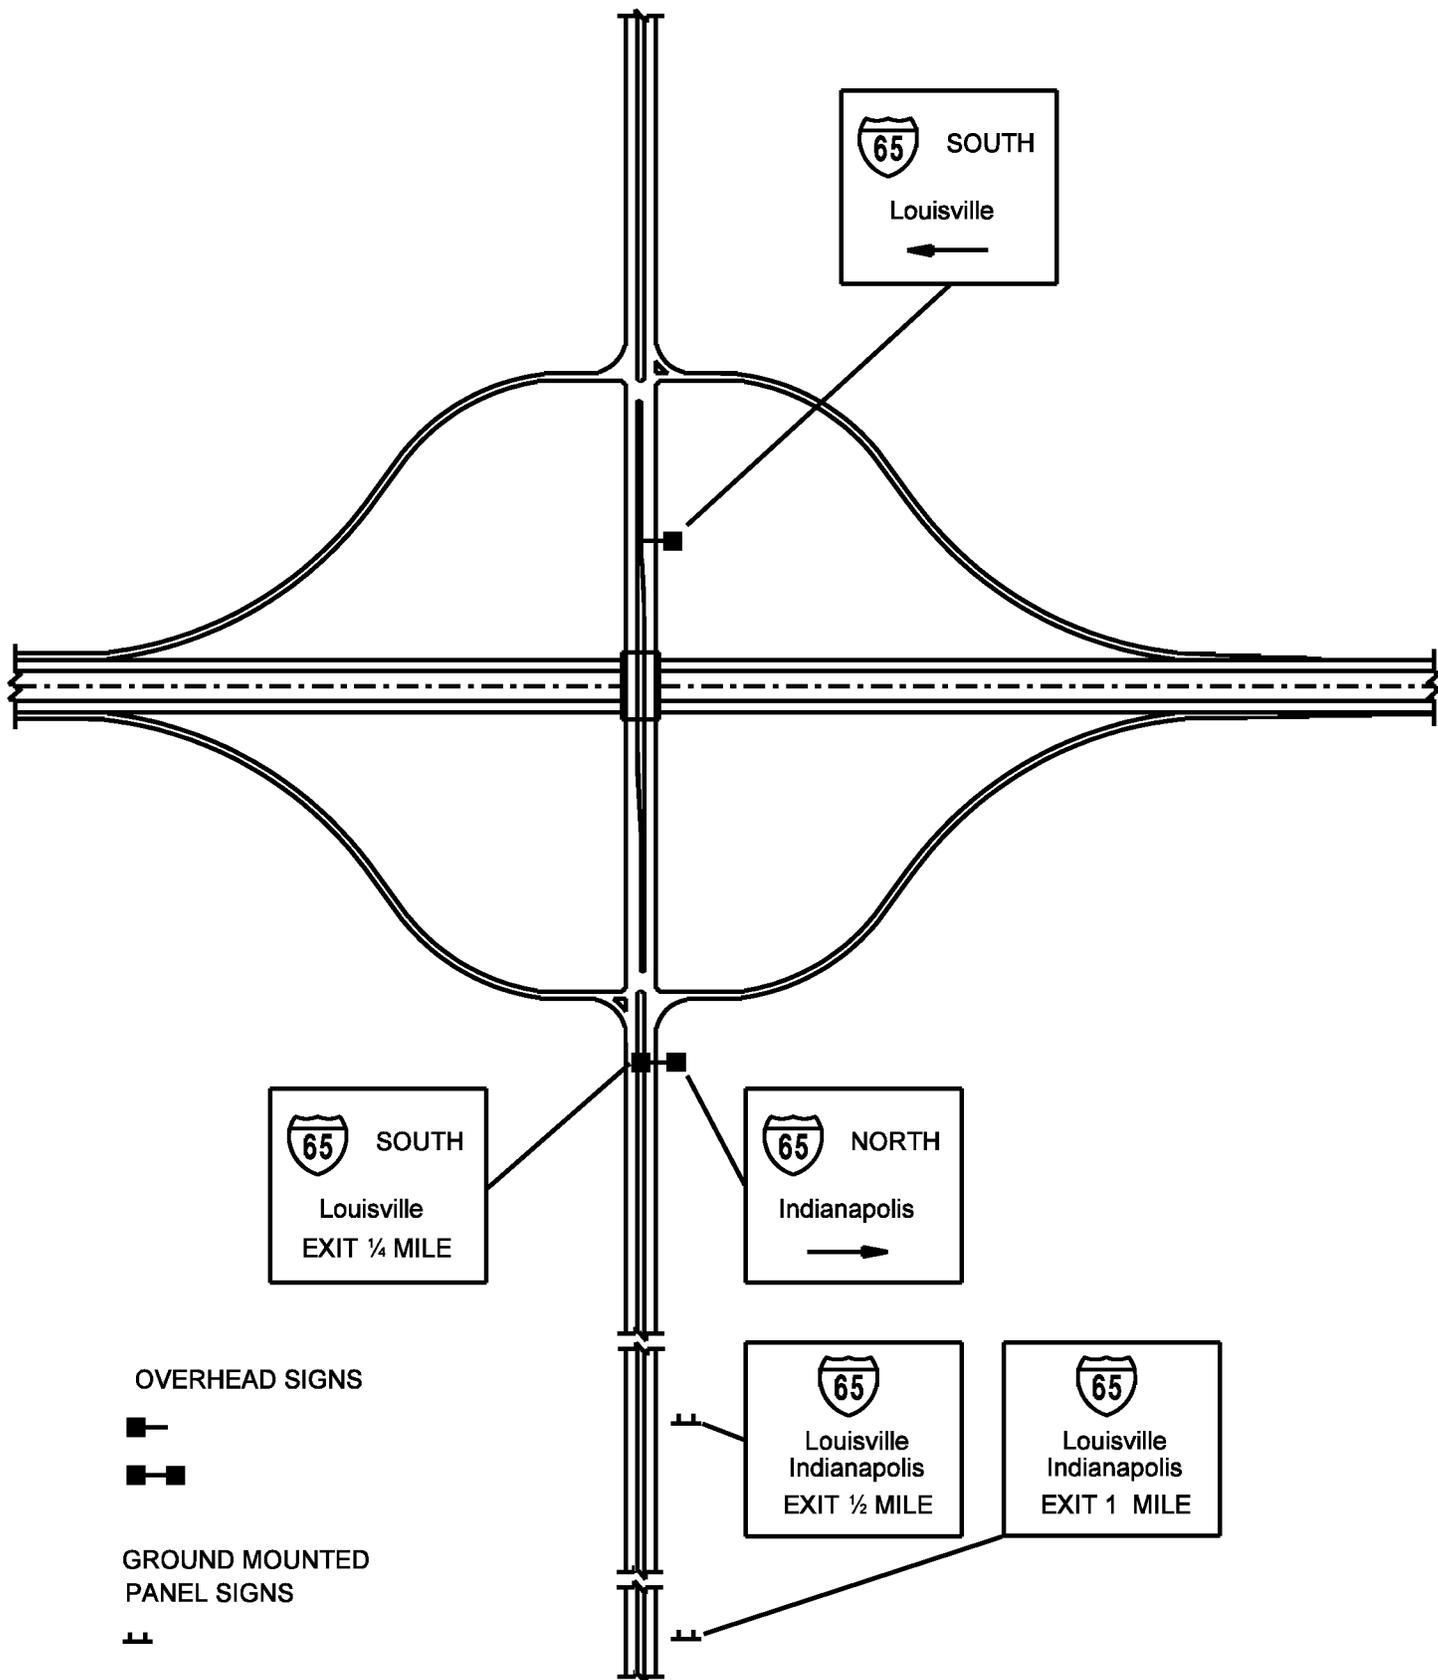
FIGURE REFERENCES FOR TYPICAL CROSSROAD SIGNING
